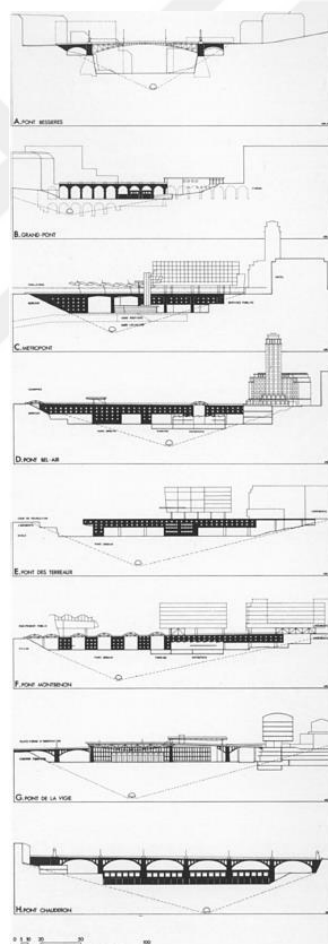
89: Bridge City, elevations of the existing bridges and the new point-villes (Tschumi, 1989, p.30).
